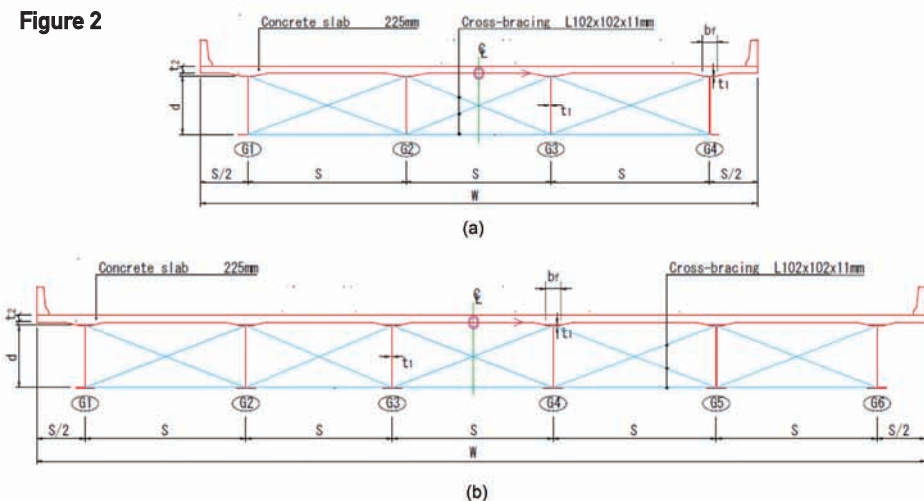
Cross-section diagram of a concrete slab over steel I-girder bridge for (a) one-lane; (b) four-lane.
